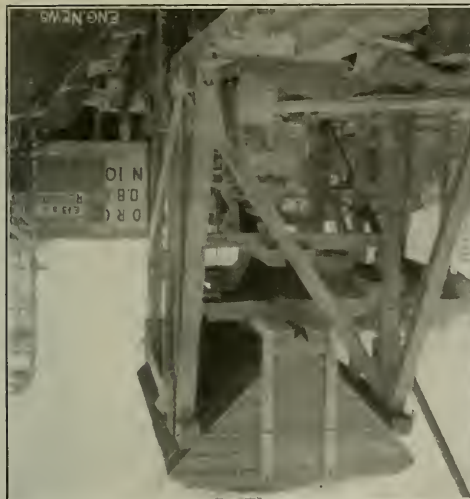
PNEUMATIC CONCRETE MIXING AND CONVEYING PLANT FOR HARLEM RIVER TUNNELS
